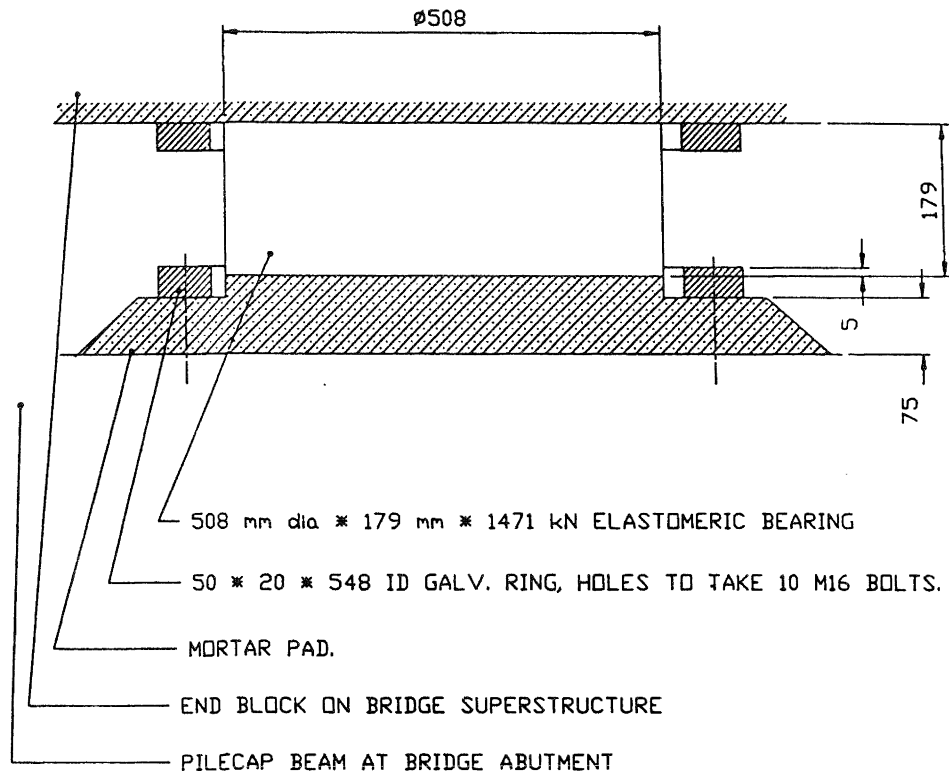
Te Teko bridge lead-rubber bearing - as installed
